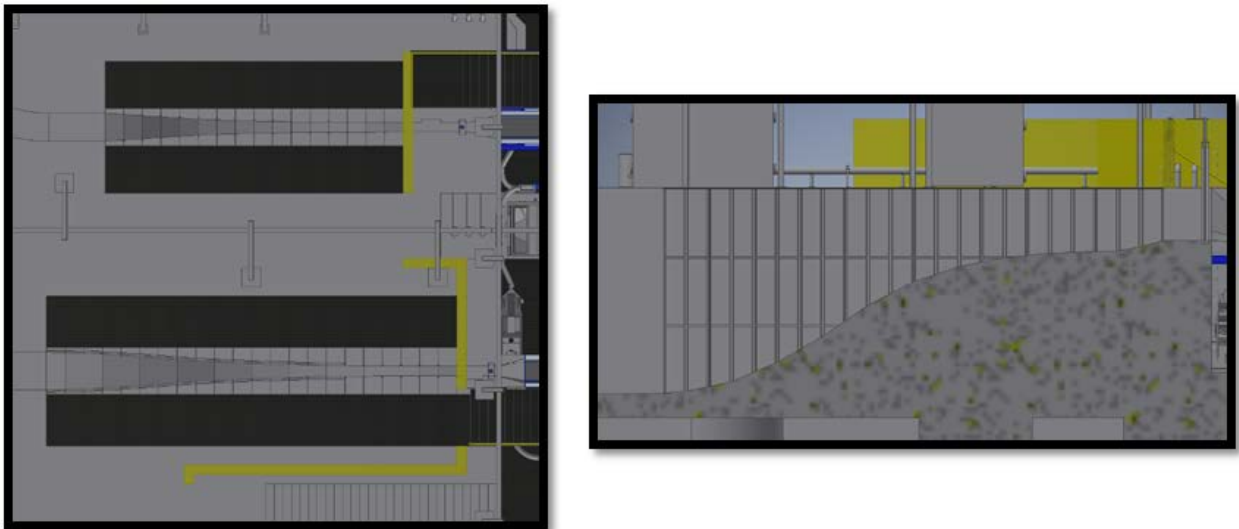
Secondary Screen Areas, Plan and Section Views
